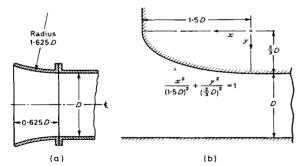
(a) Simple bellmouth; (b) elliptical roof profile for conduit intake with parallel sides and horizontal floor. (After US Army Corps of Engineers (1952–70) *Hydraulic design criteria*. US Army Engineer Waterways Experiment Station, Vicksburg, Mississippi)
